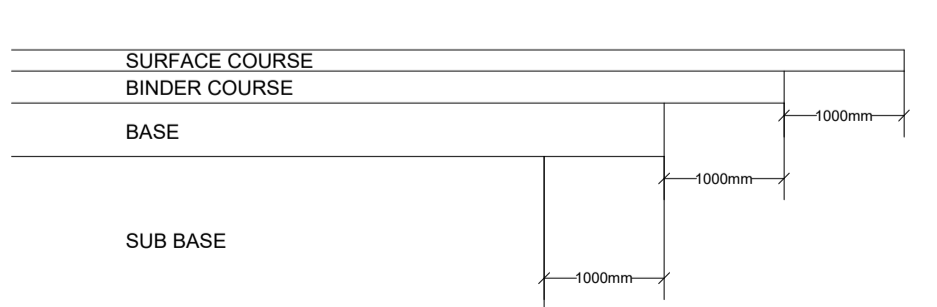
ROAD E CONSTRUCTION DETAILS (1:20)
